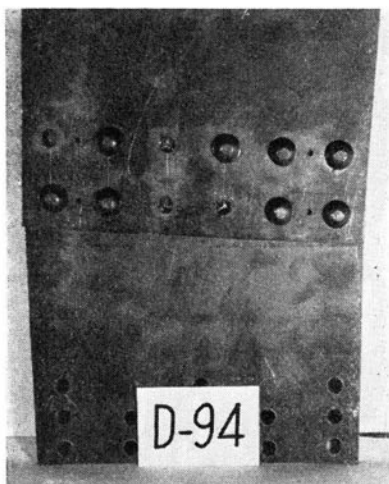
FAILURE BY RIVET SHEAR; LAP JOINT WITH DOUBLE ROW OF RIVETS, RIVETS IN SINGLE SHEAR, SPECIMEN D-94
